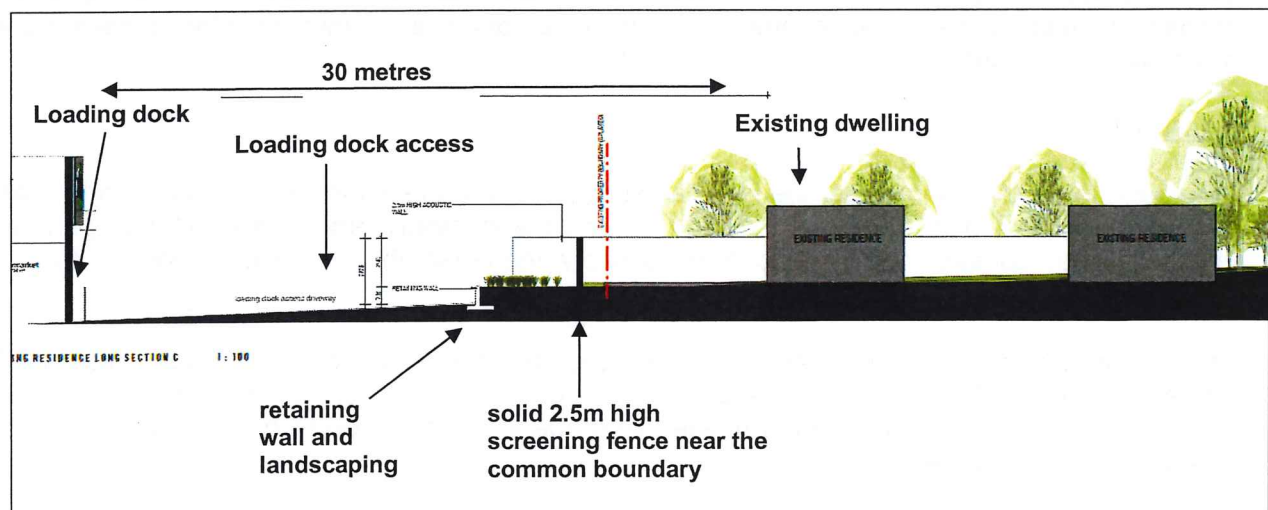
Section from loading dock to nearest dwelling and acoustic treatment (source: Applicant's RtS)
